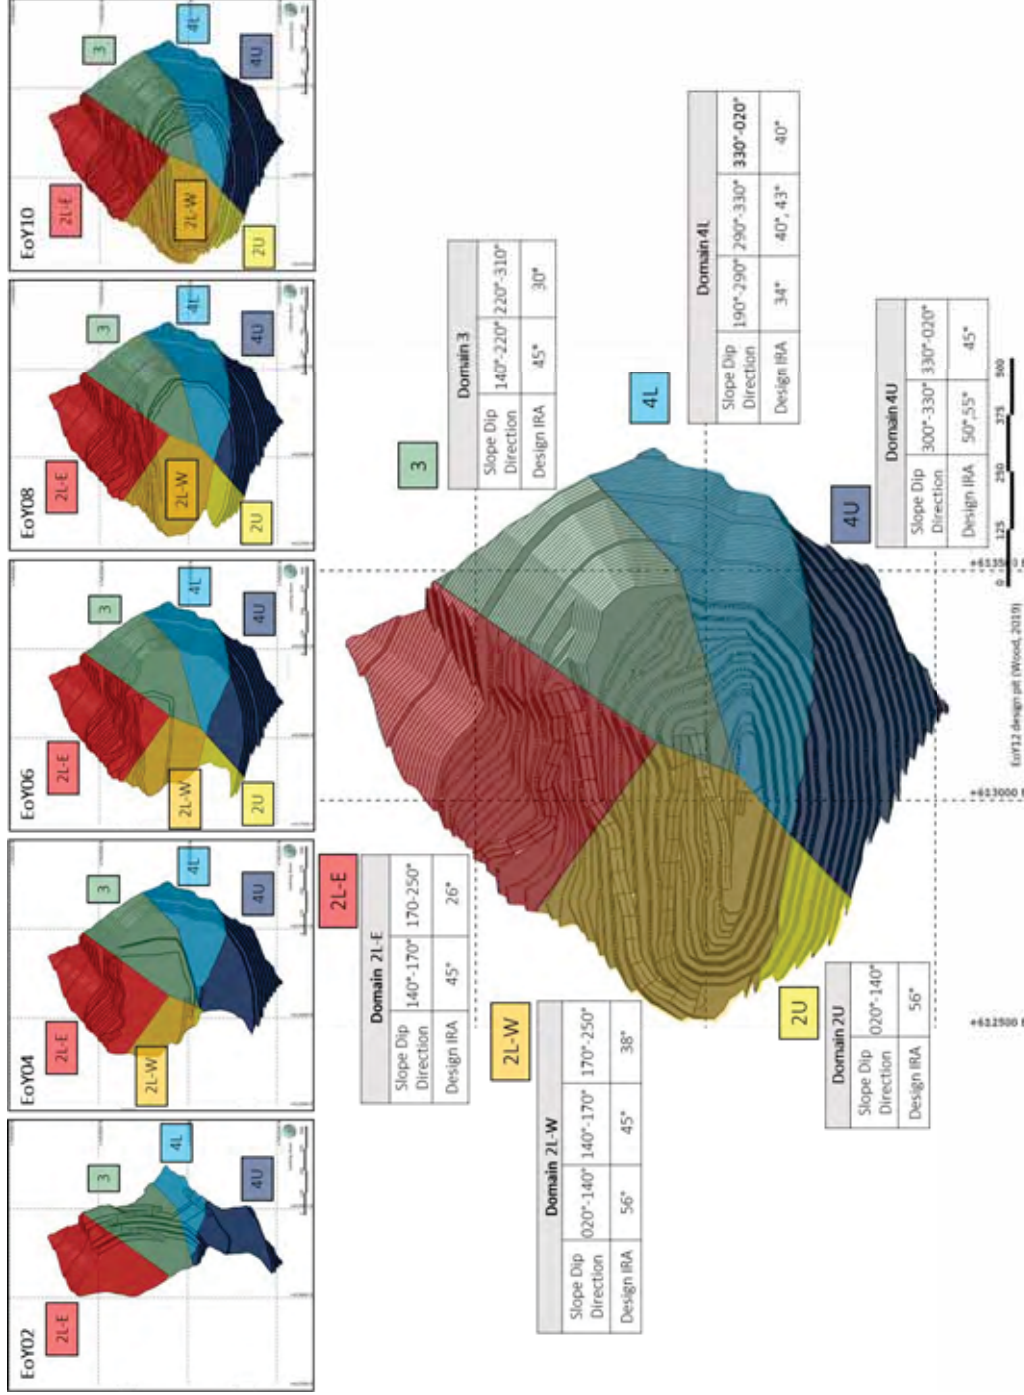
Recommended Inter-Ramp Angles by Slope Design Sector (Wood, 2019)
